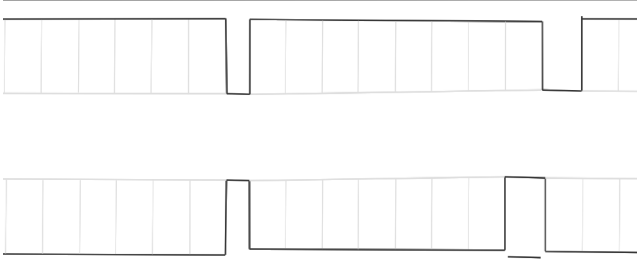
The floor plan of the parking environment: wall elements (black), parking slots (grey)
